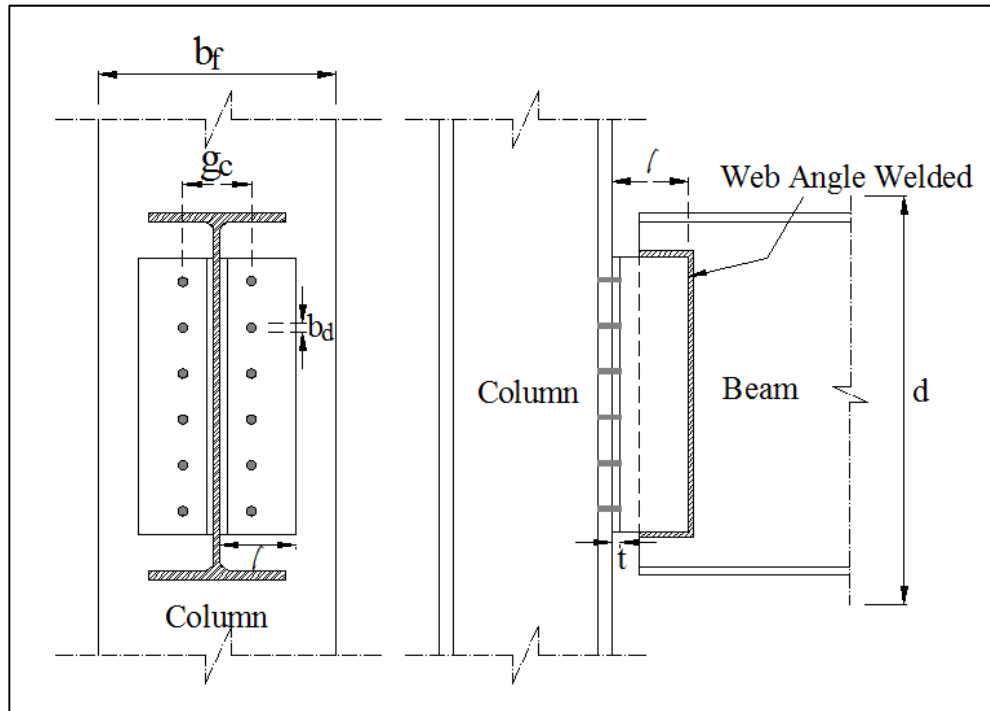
Configuration Of Welded/Bolted Double Web Angle Connection Test Specimen
